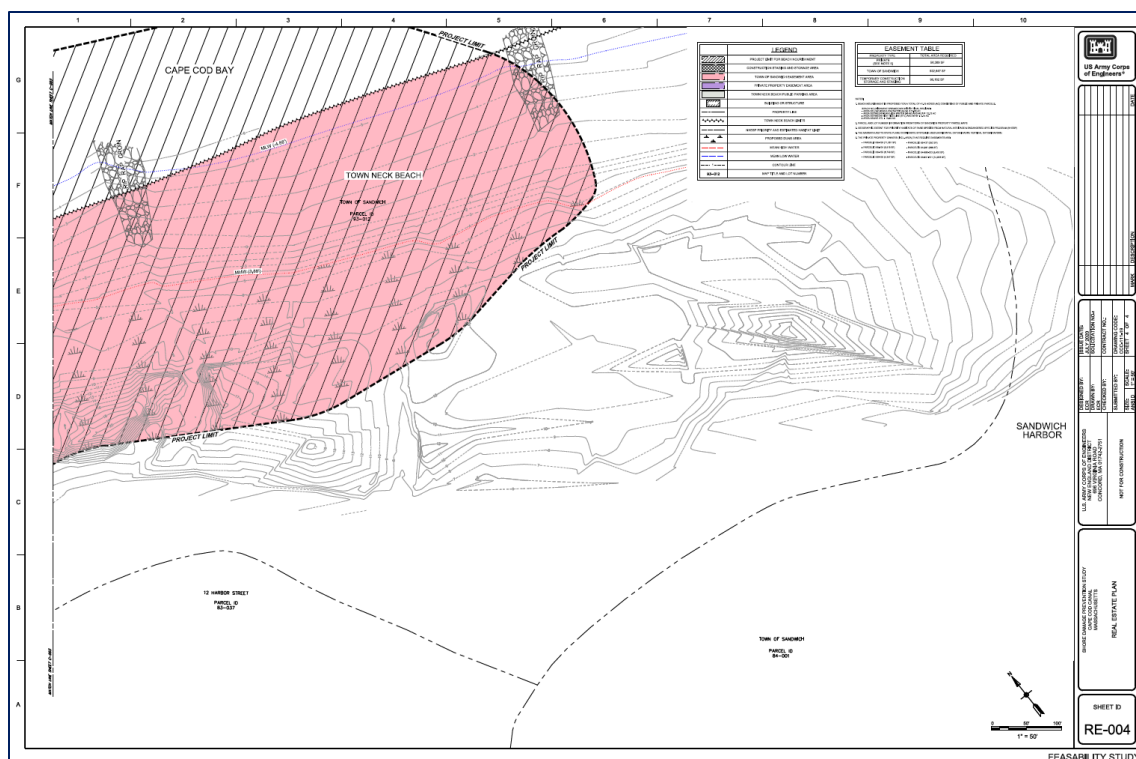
Real Estate Impacts of Recommended Plan sheet 4 of 4
